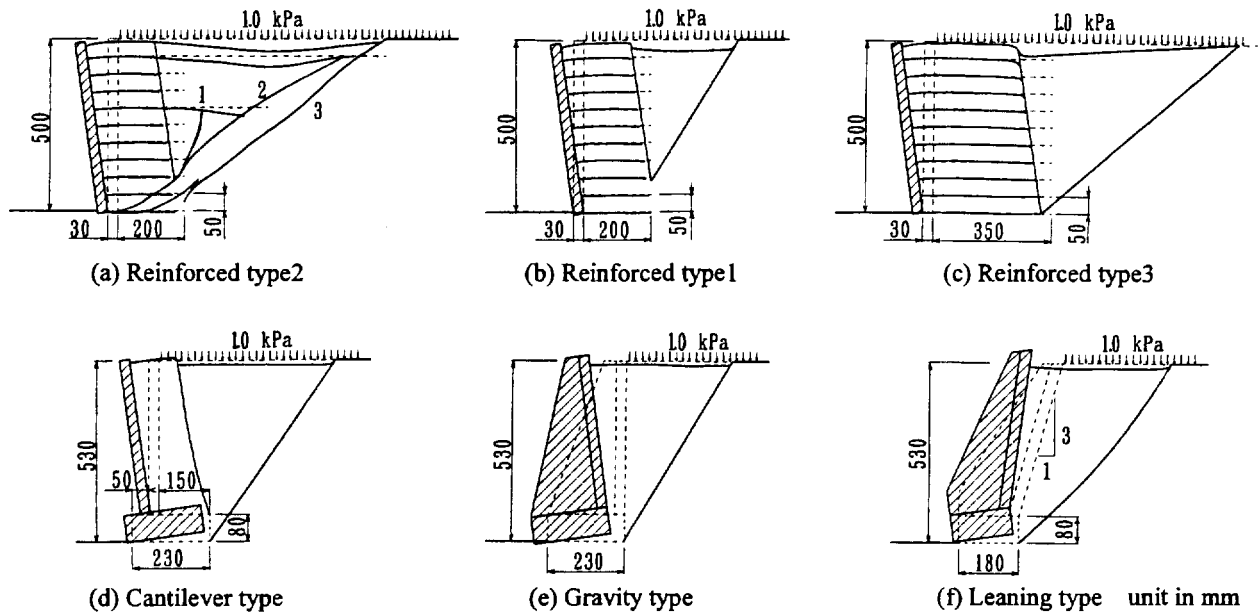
Models of retaining walls showing their initial and displaced locations and observed failure planes; a) GRS-RW having a couple of extended top reinforcement layers, denoted as “Reinforced type 2” in Figs 4.8 and 6.2; b) GRS-RW having short reinforcement layers, denoted as “Reinforced type 1”; c) GRS-RW having moderately long reinforcement layers, denoted as “Reinforced type 3”; d) cantilever-type RW; e) gravity-type RW; and f) leaning-type RW (Koseki et al., 1997).
